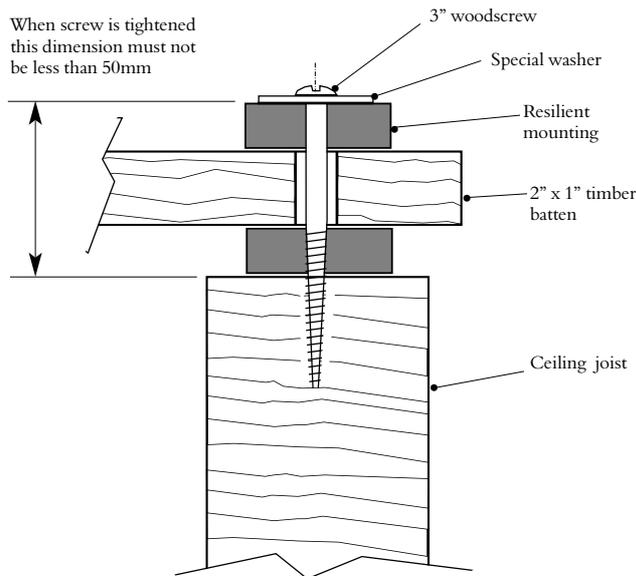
Fitting anti vibration mountings (unit installed onto joists).
